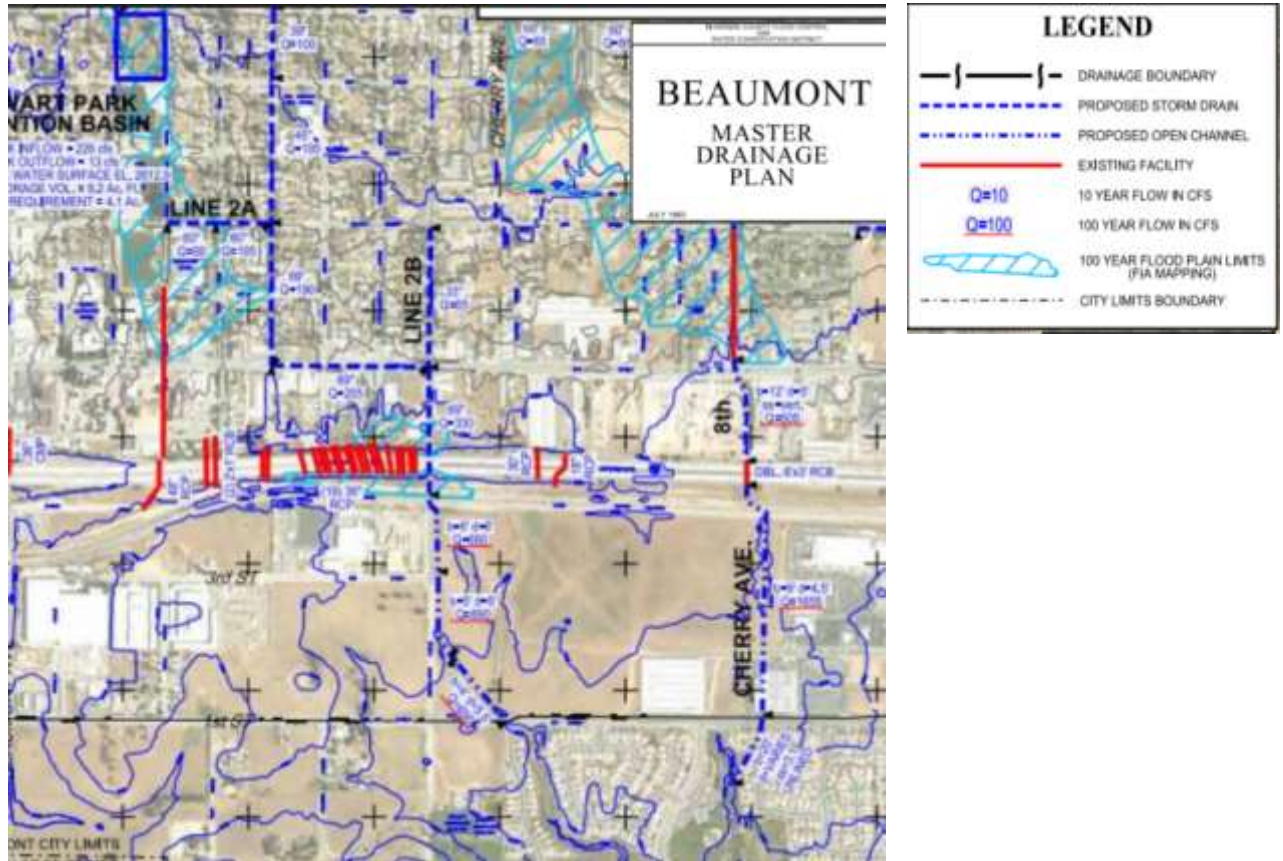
Depicts City of Beaumont's Master Drainage Plan.
